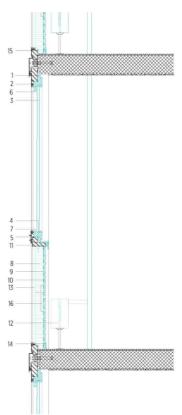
Retrofitted detail section from communal corridor and from regular floor plan (6)
